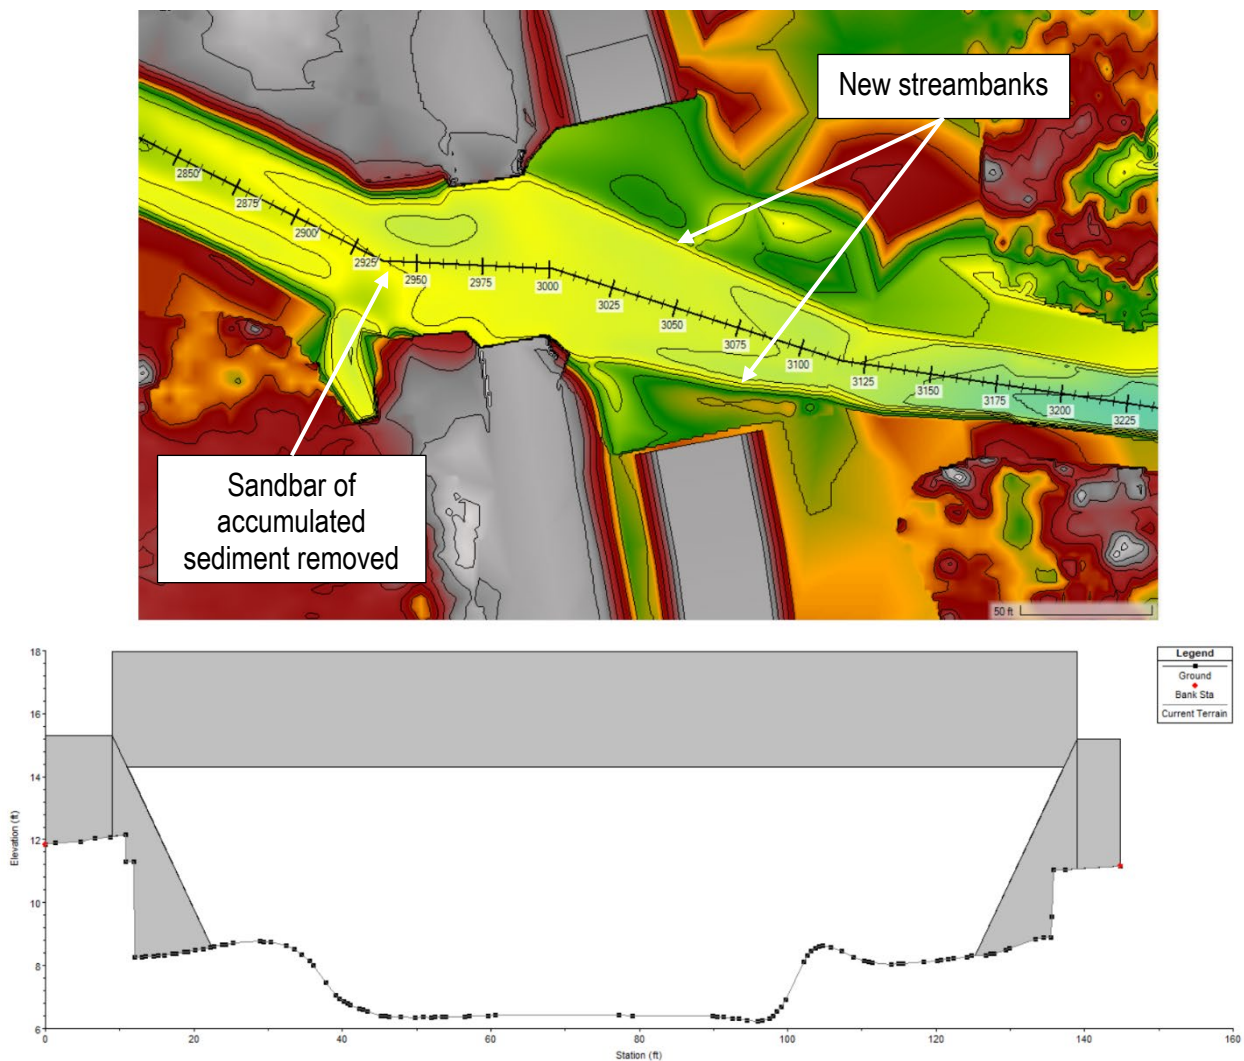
Proposed Acrow Bridge on Waiahole Stream.
